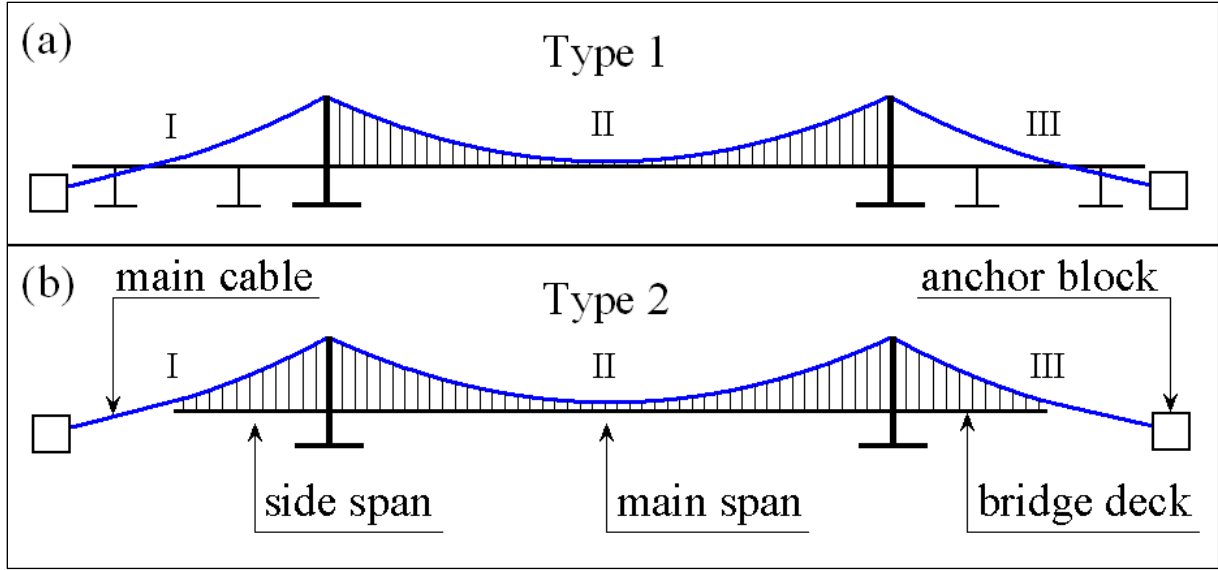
Two possible types of symmetric suspension bridges. (a) The side span section of the bridge deck rest on columns. This means that the side span sections of the main cables do not carry any portion of the bridge deck. (b) The side span sections of the bridge deck are carried by the main cables.
